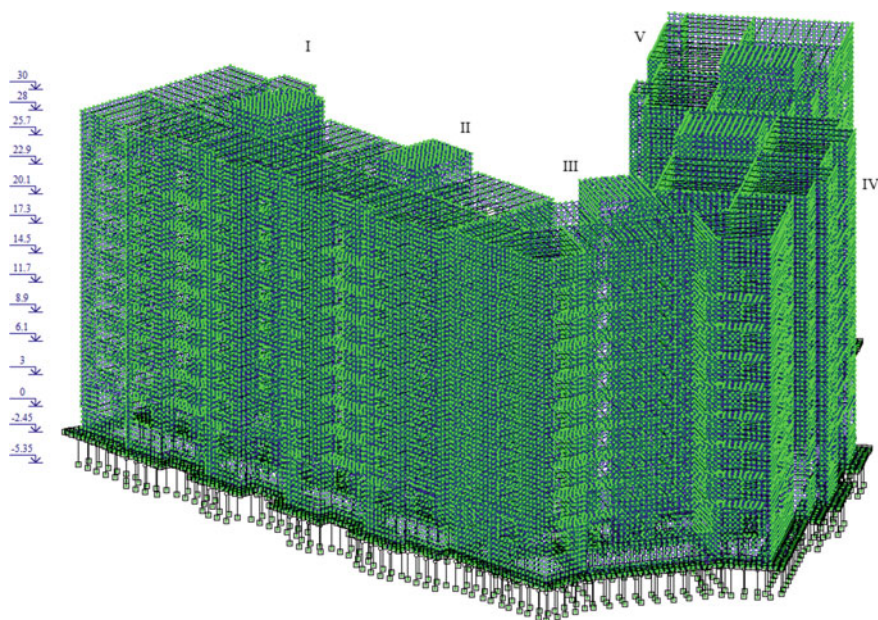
Calculation scheme for 3D modeling of the FEM system “five-section brick residential building—reinforced concrete strip foundation—soil—cement base—sand base”
